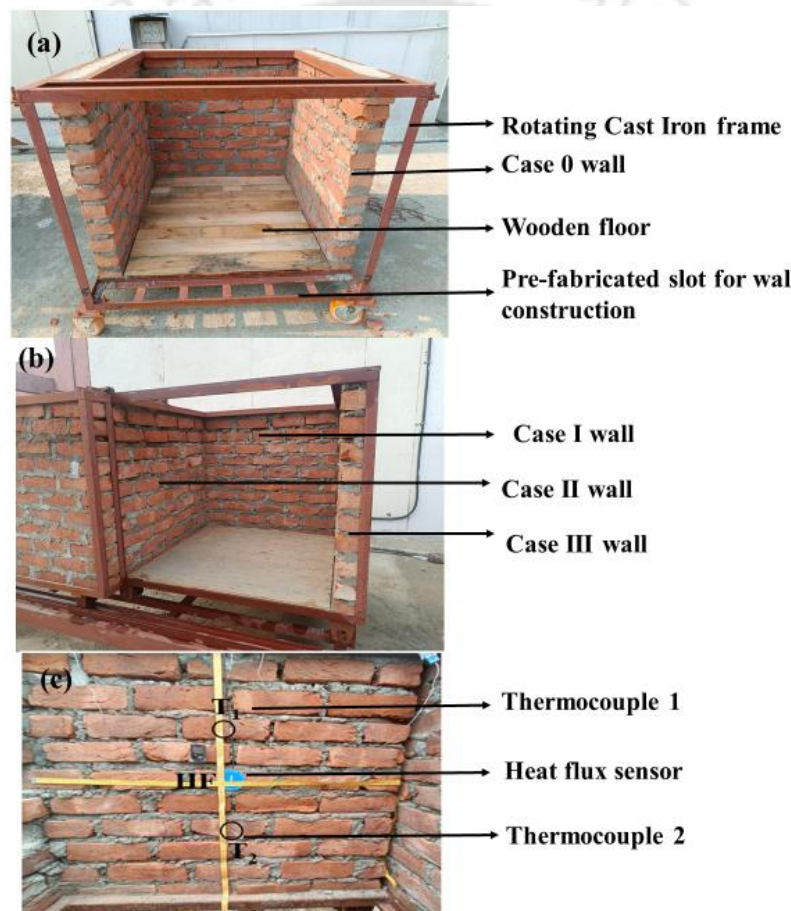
(a) Wall construction on pre-fabricated cast iron frame (Case 0), (b) WH-PCM brick wall construction, (c) Thermocouple and heat flux sensor position on each wall
